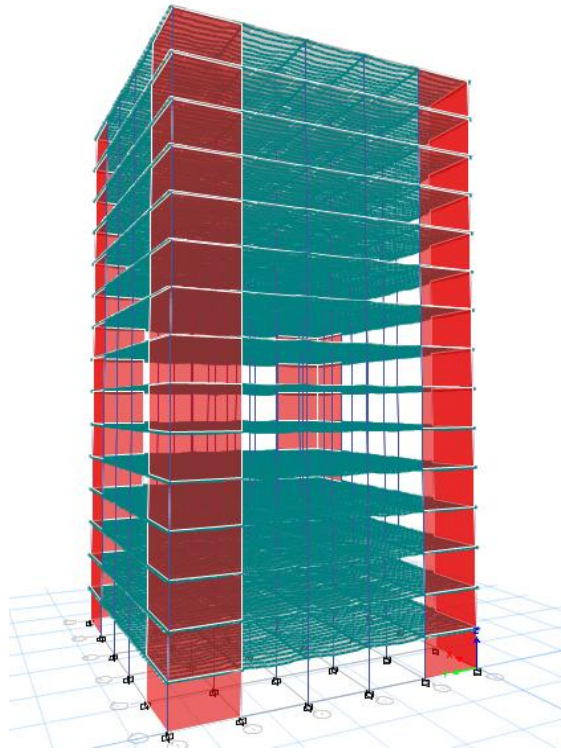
Elevation of Post-tensioned Flat slab Structure with “L” shaped Shear wall at corners
